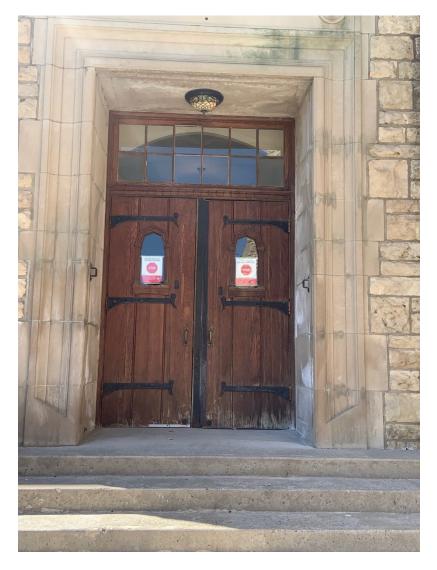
North East Door Proposed for Replacement, 200 Water Street North. Photo provided by applicant.
